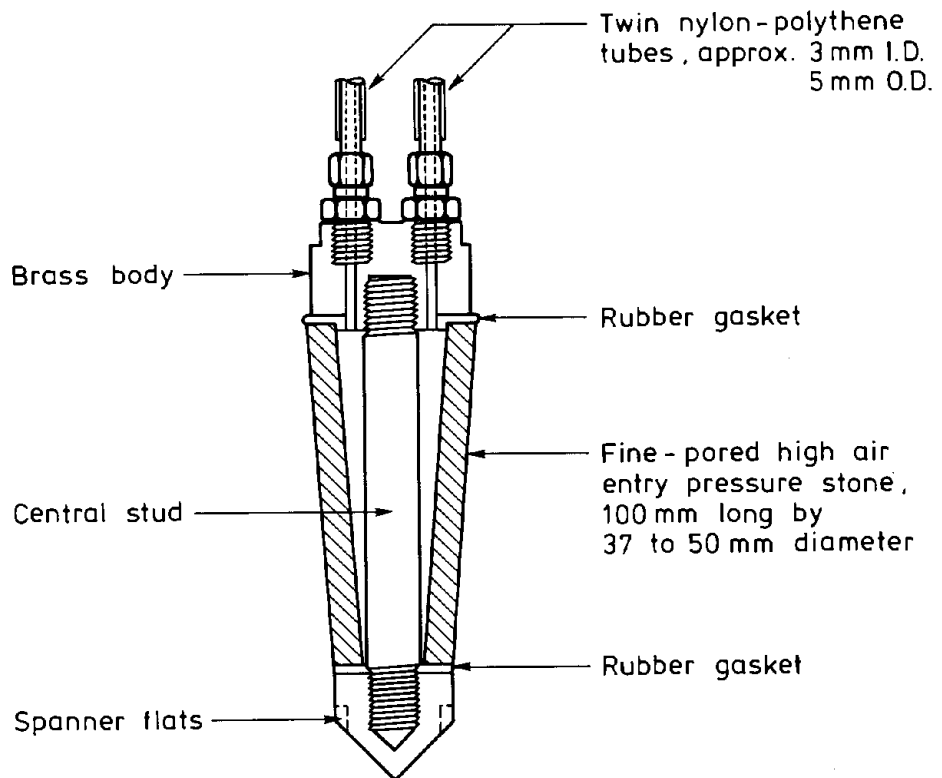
Typical Standpipe and Open-hydraulic Piezometers
